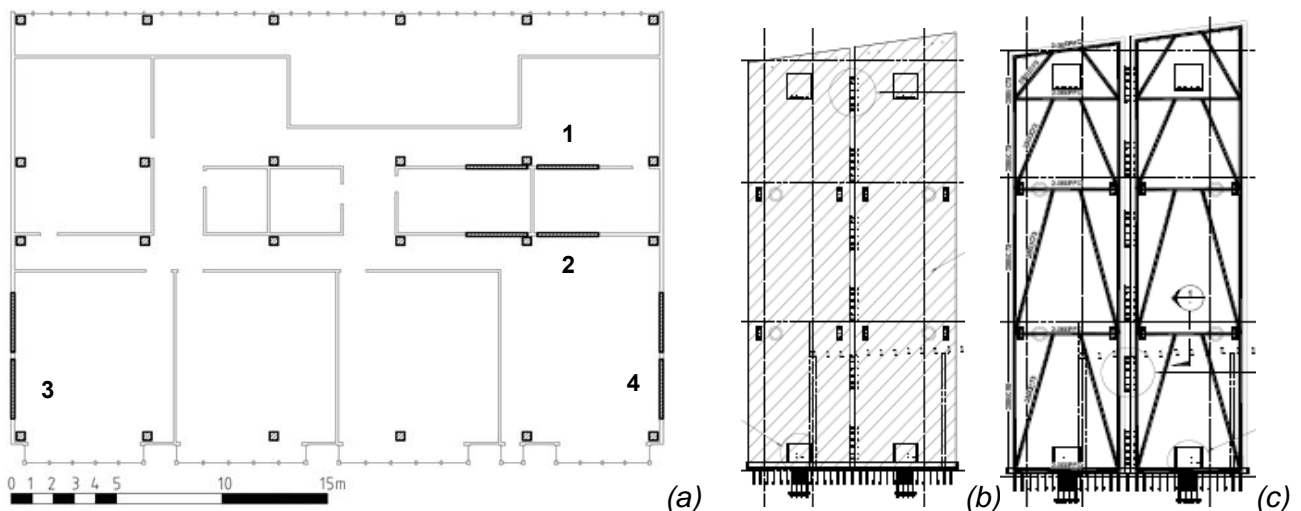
Arts building structural layout with shear wall highlighted (a), and elevation of shear walls; massive (b), and light-weight (c).
